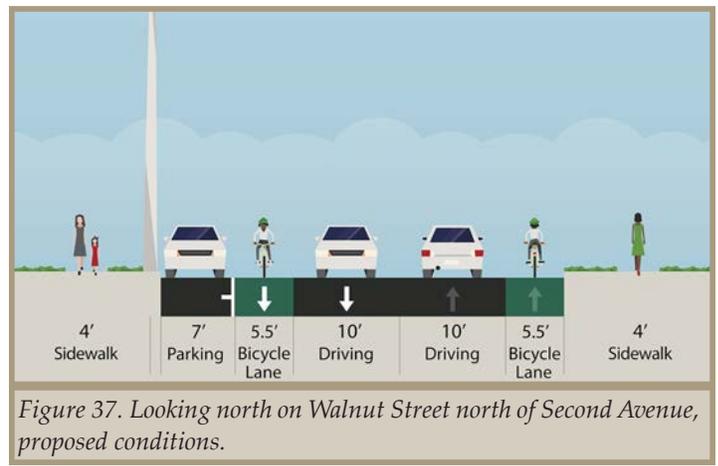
Looking north on Walnut Street north of Second Avenue, proposed conditions.
